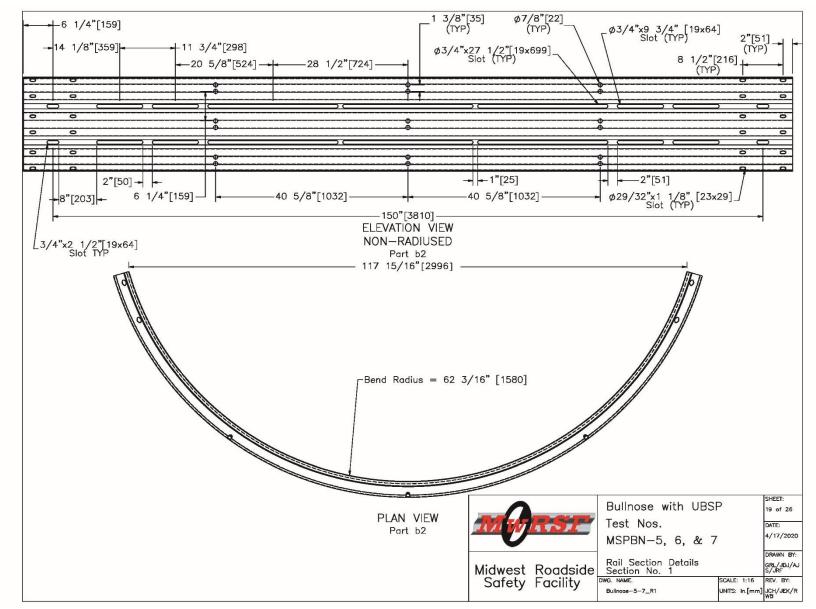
Rail Section Details Section No. 1, Test Nos. MSPBN-5 through MSPBN-7
